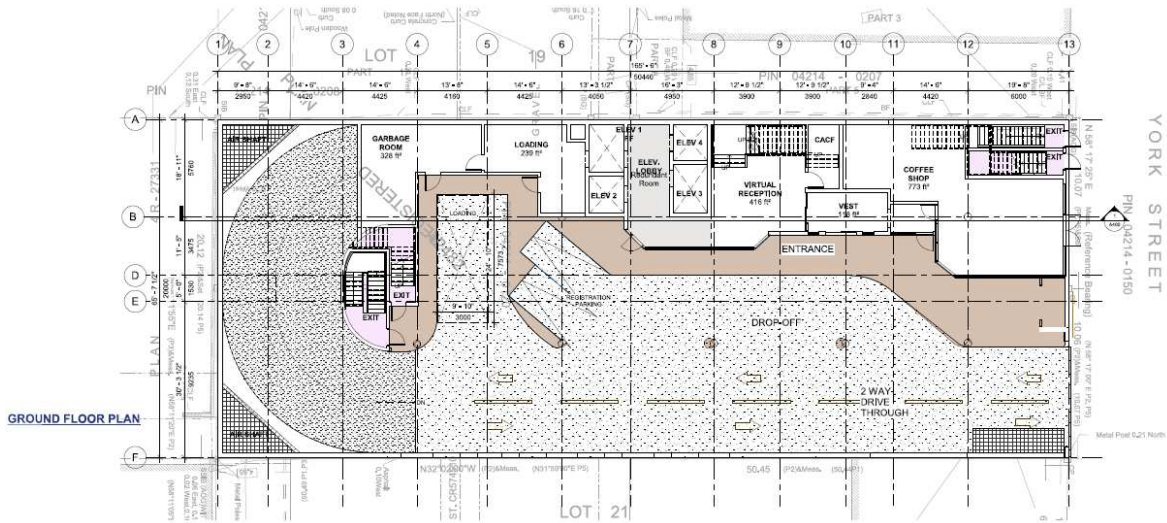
Above 116 York Street, Ground Floor Plan, as reproduced in the Design Brief, 6 July 2018;
